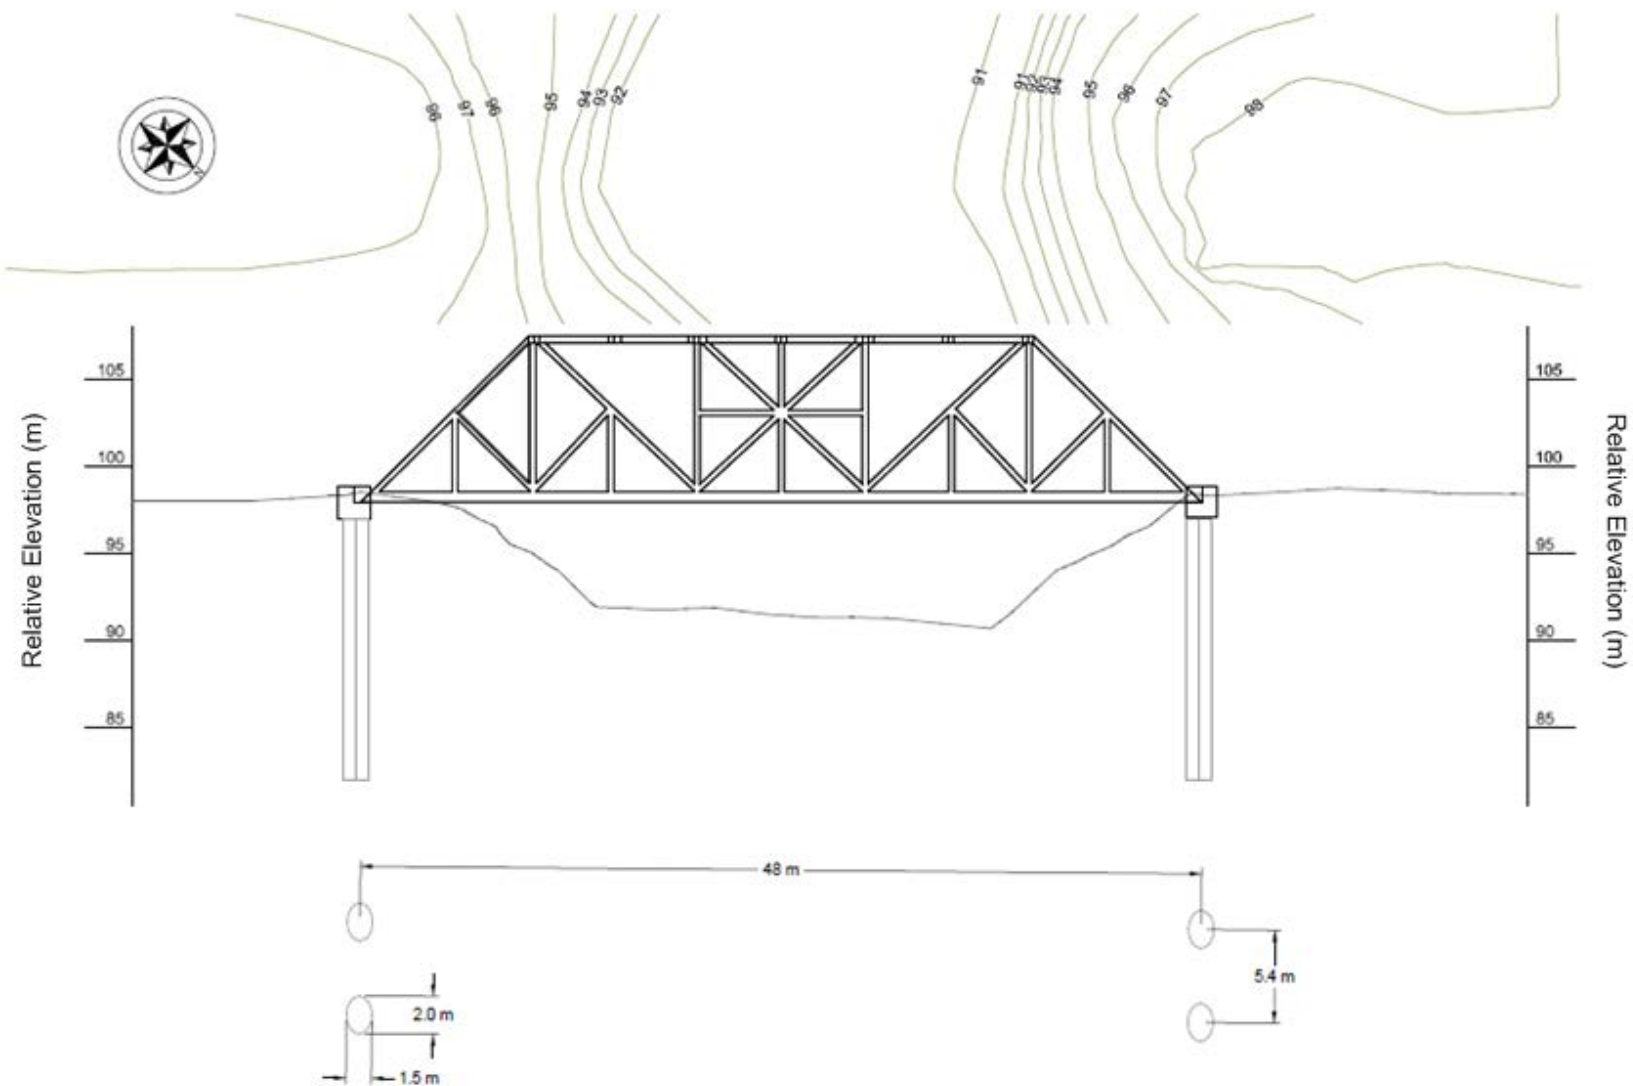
Simplified sketch of the plan and profile views of the Rio Bananito Railway Bridge
